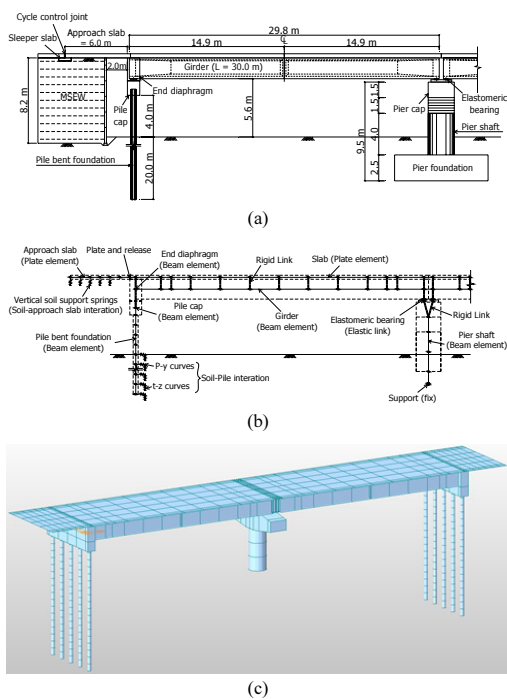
Structural analysis model for IPM bridge (a) Section view; (b) Numerical model, (c) 3D model (60.0m with 2-span bridge)
